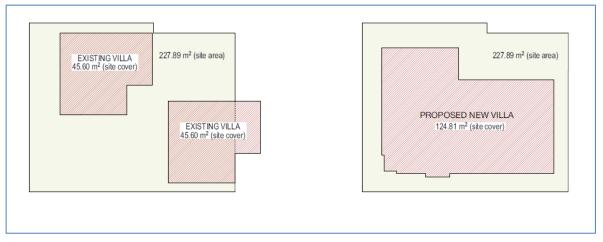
Existing building site cover on the left and the proposed site cover on the right.
